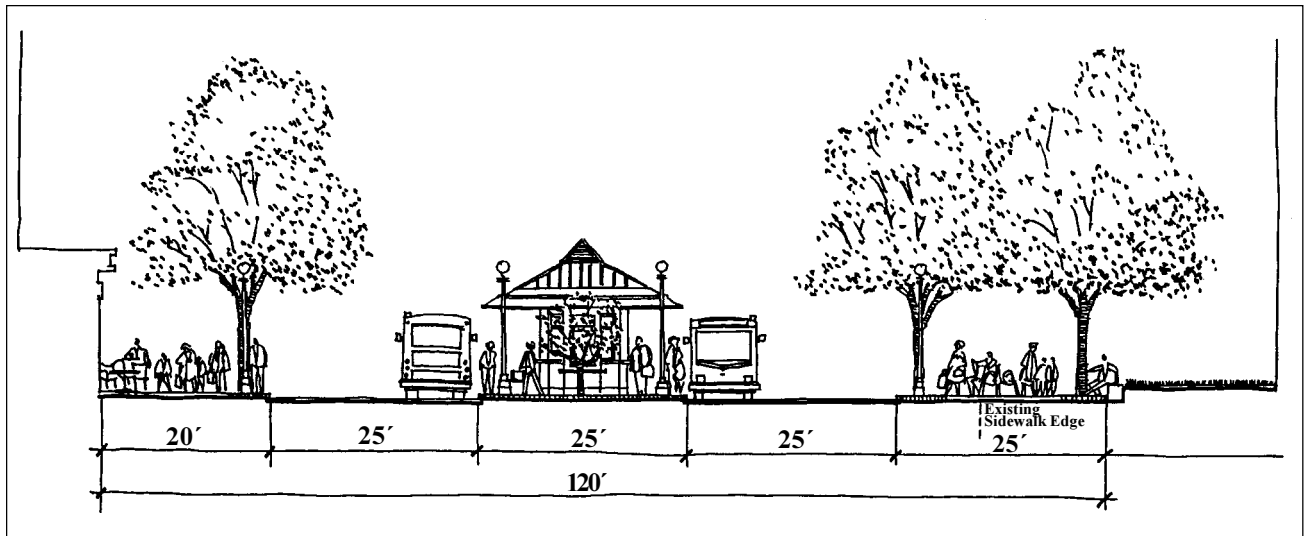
"Transit Central" West End Section – West End – Widened Sidewalk Along North Side
